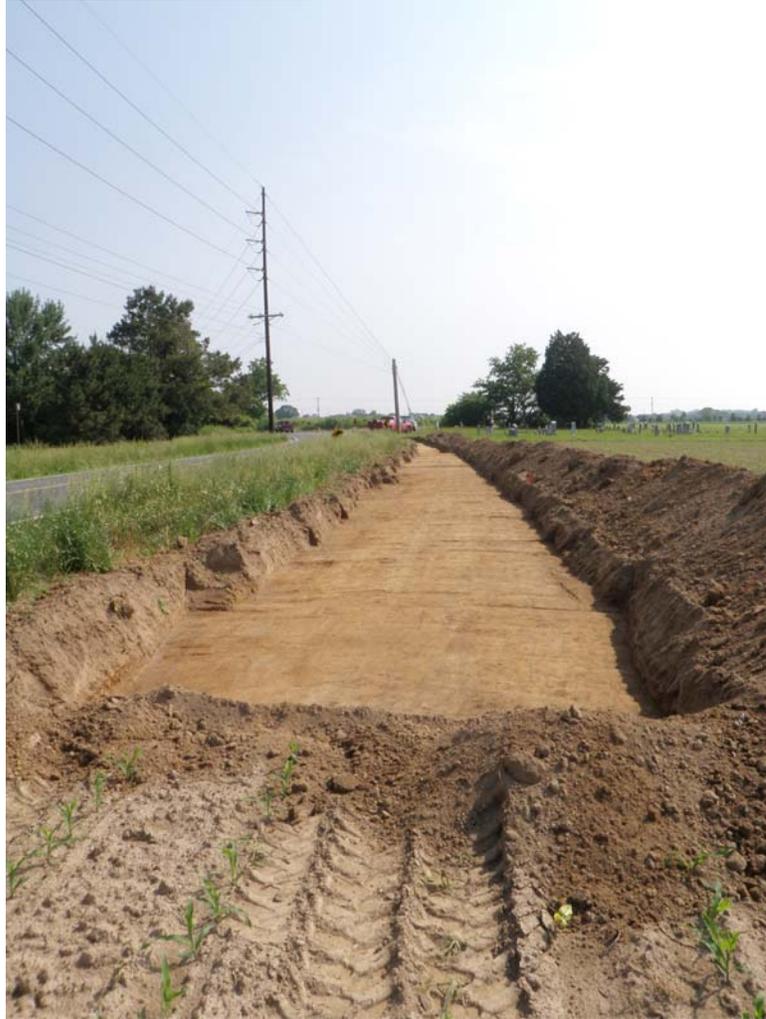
Trench 2 excavated within the project area on the east side of Cedar Grove Road, view northeast.
